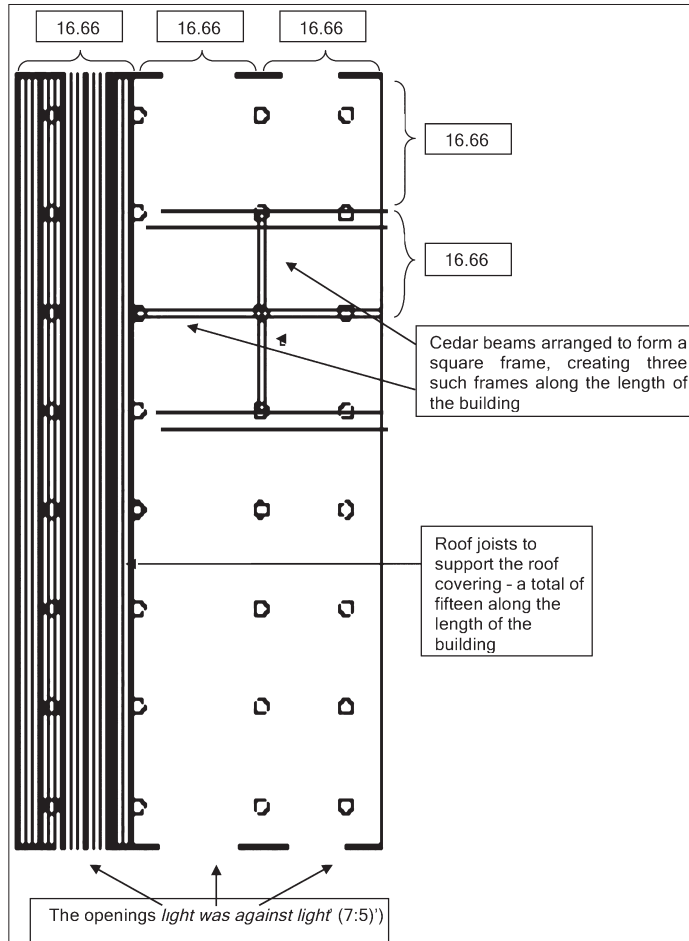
Proposed reflected roof plan of the 'house of the forest of Lebanon'.
